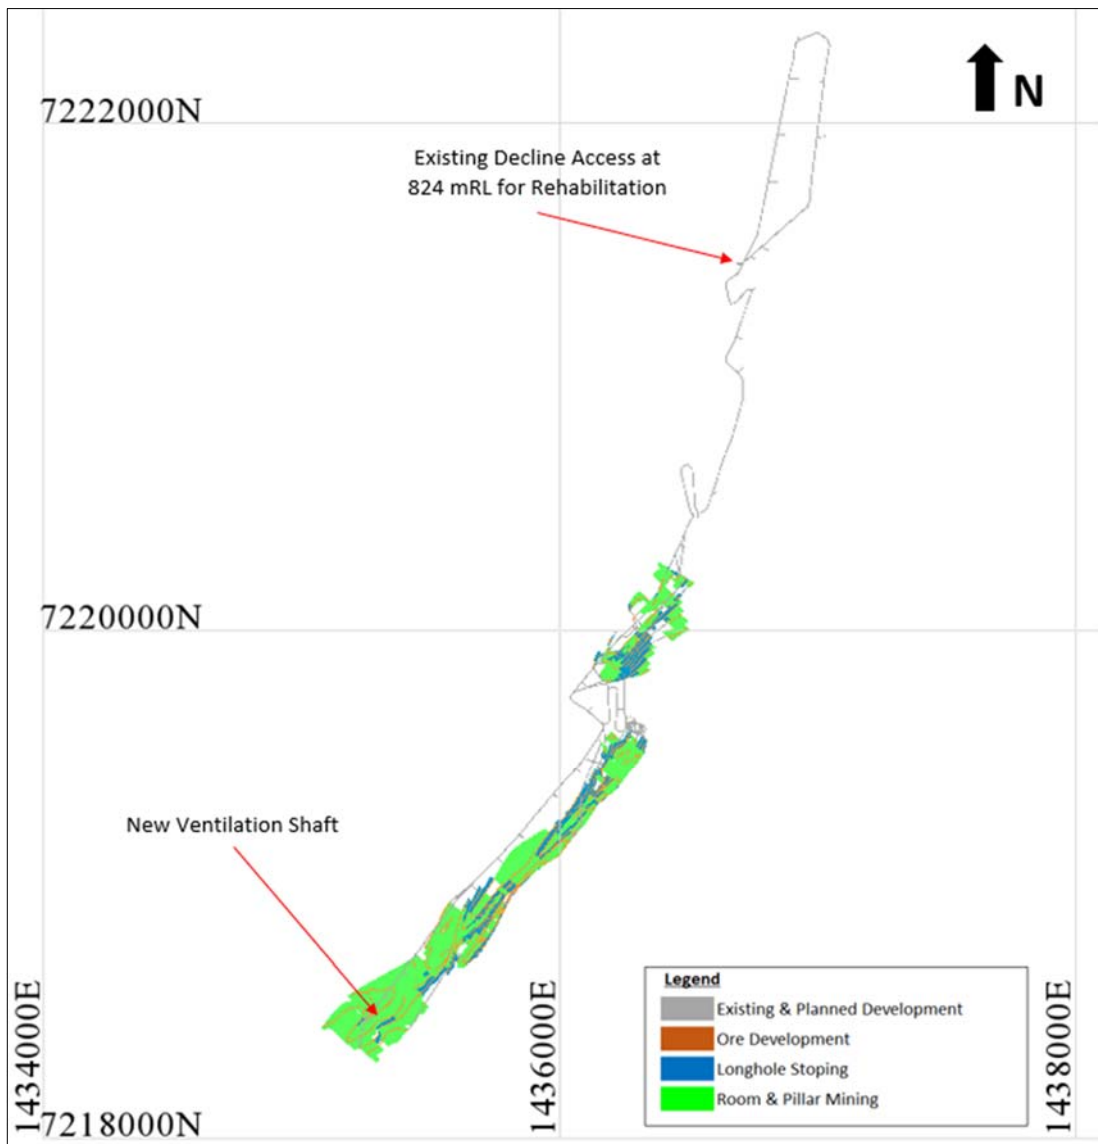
Plan view of the Stekenjokk Mining Inventory by mining method and existing and planned development
